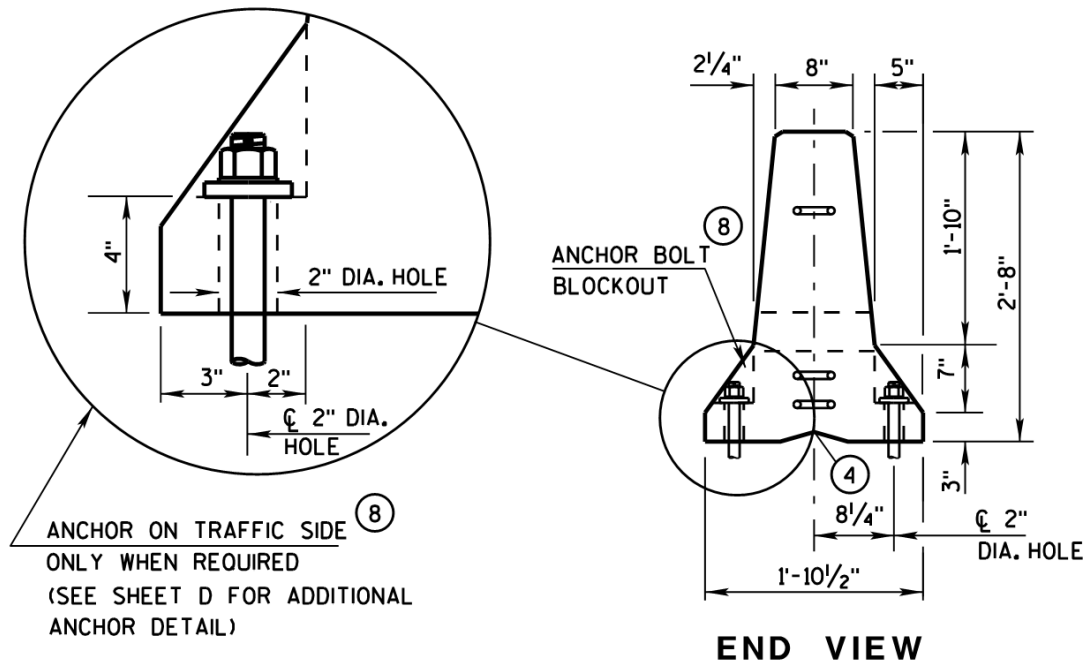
WisDOT temporary precast concrete barrier with adhesive anchors, MASH TL-3 Rating.
